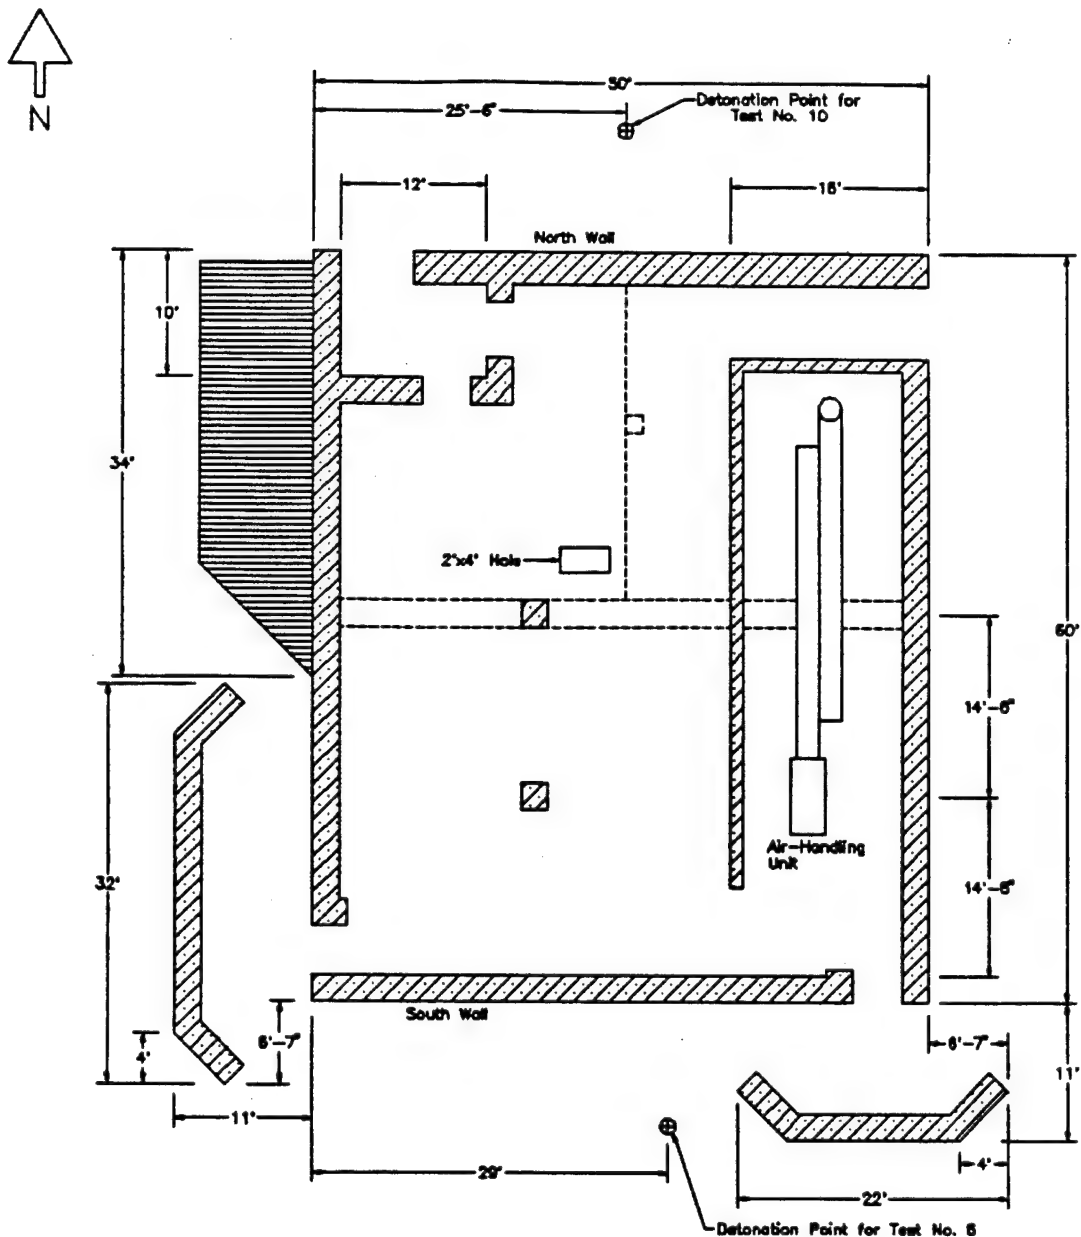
Plan View of Tyndall Test Structure, Ground Floor.
